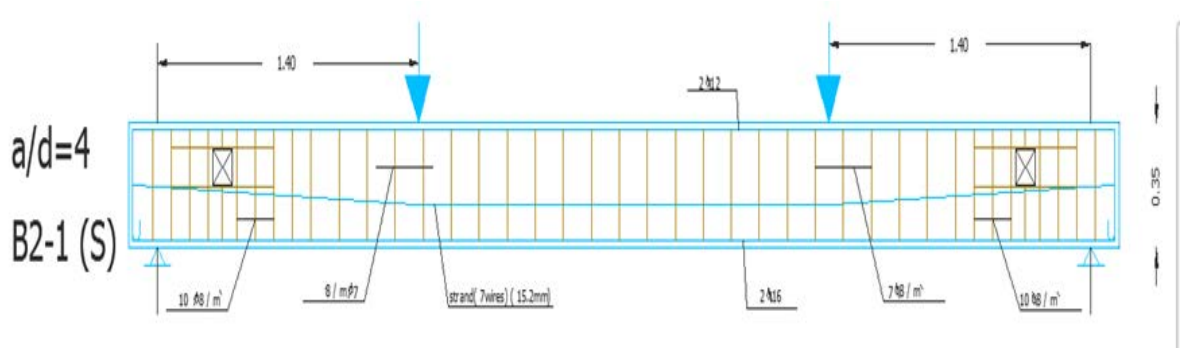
Detailed of reinforced and Prestressed steel (strand) in beam B2-1(S)
